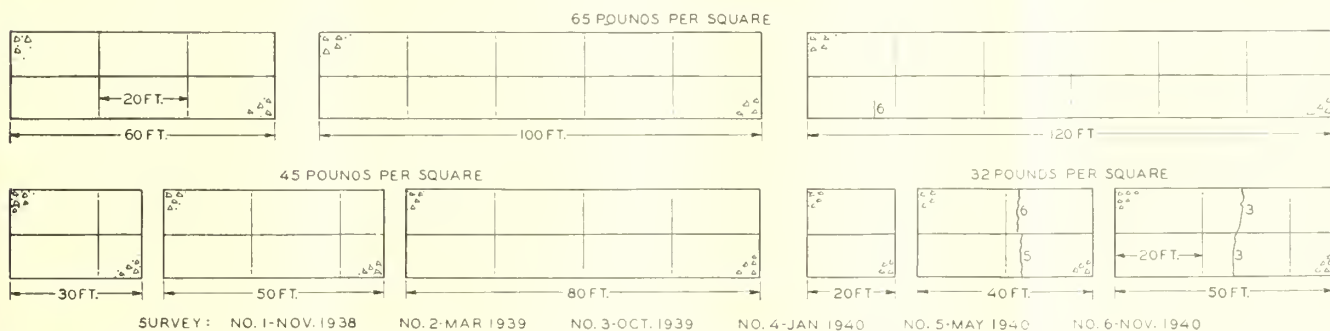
TYPICAL CRACK SURVEY SHEET FOR SHORT SECTIONS REINFORCED WITH WELDED FABRIC; SECTIONS PLACED SEPTEMBER-OCTOBER, 1938.
